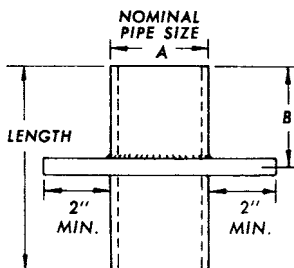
PIPE SLEEVE WITH WELDED LUGS
